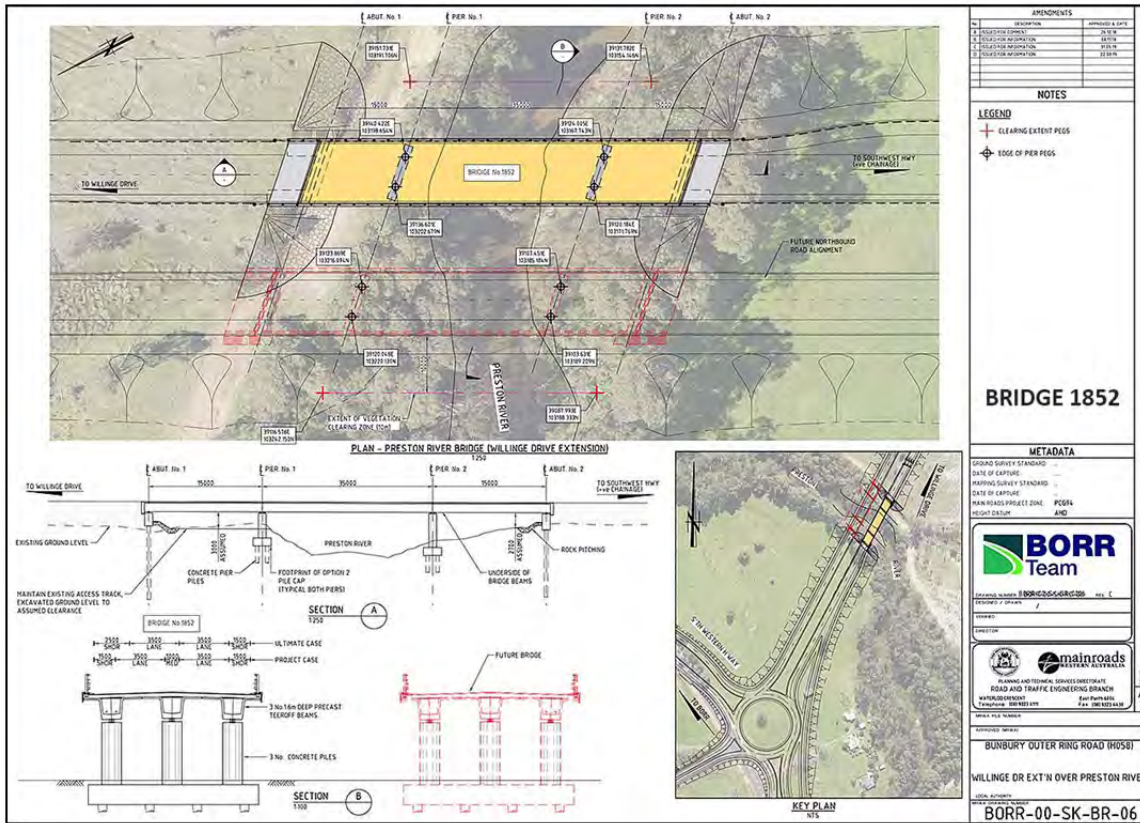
Bridge 1852 over the Preston River at 379107mE & 6303922mN.
